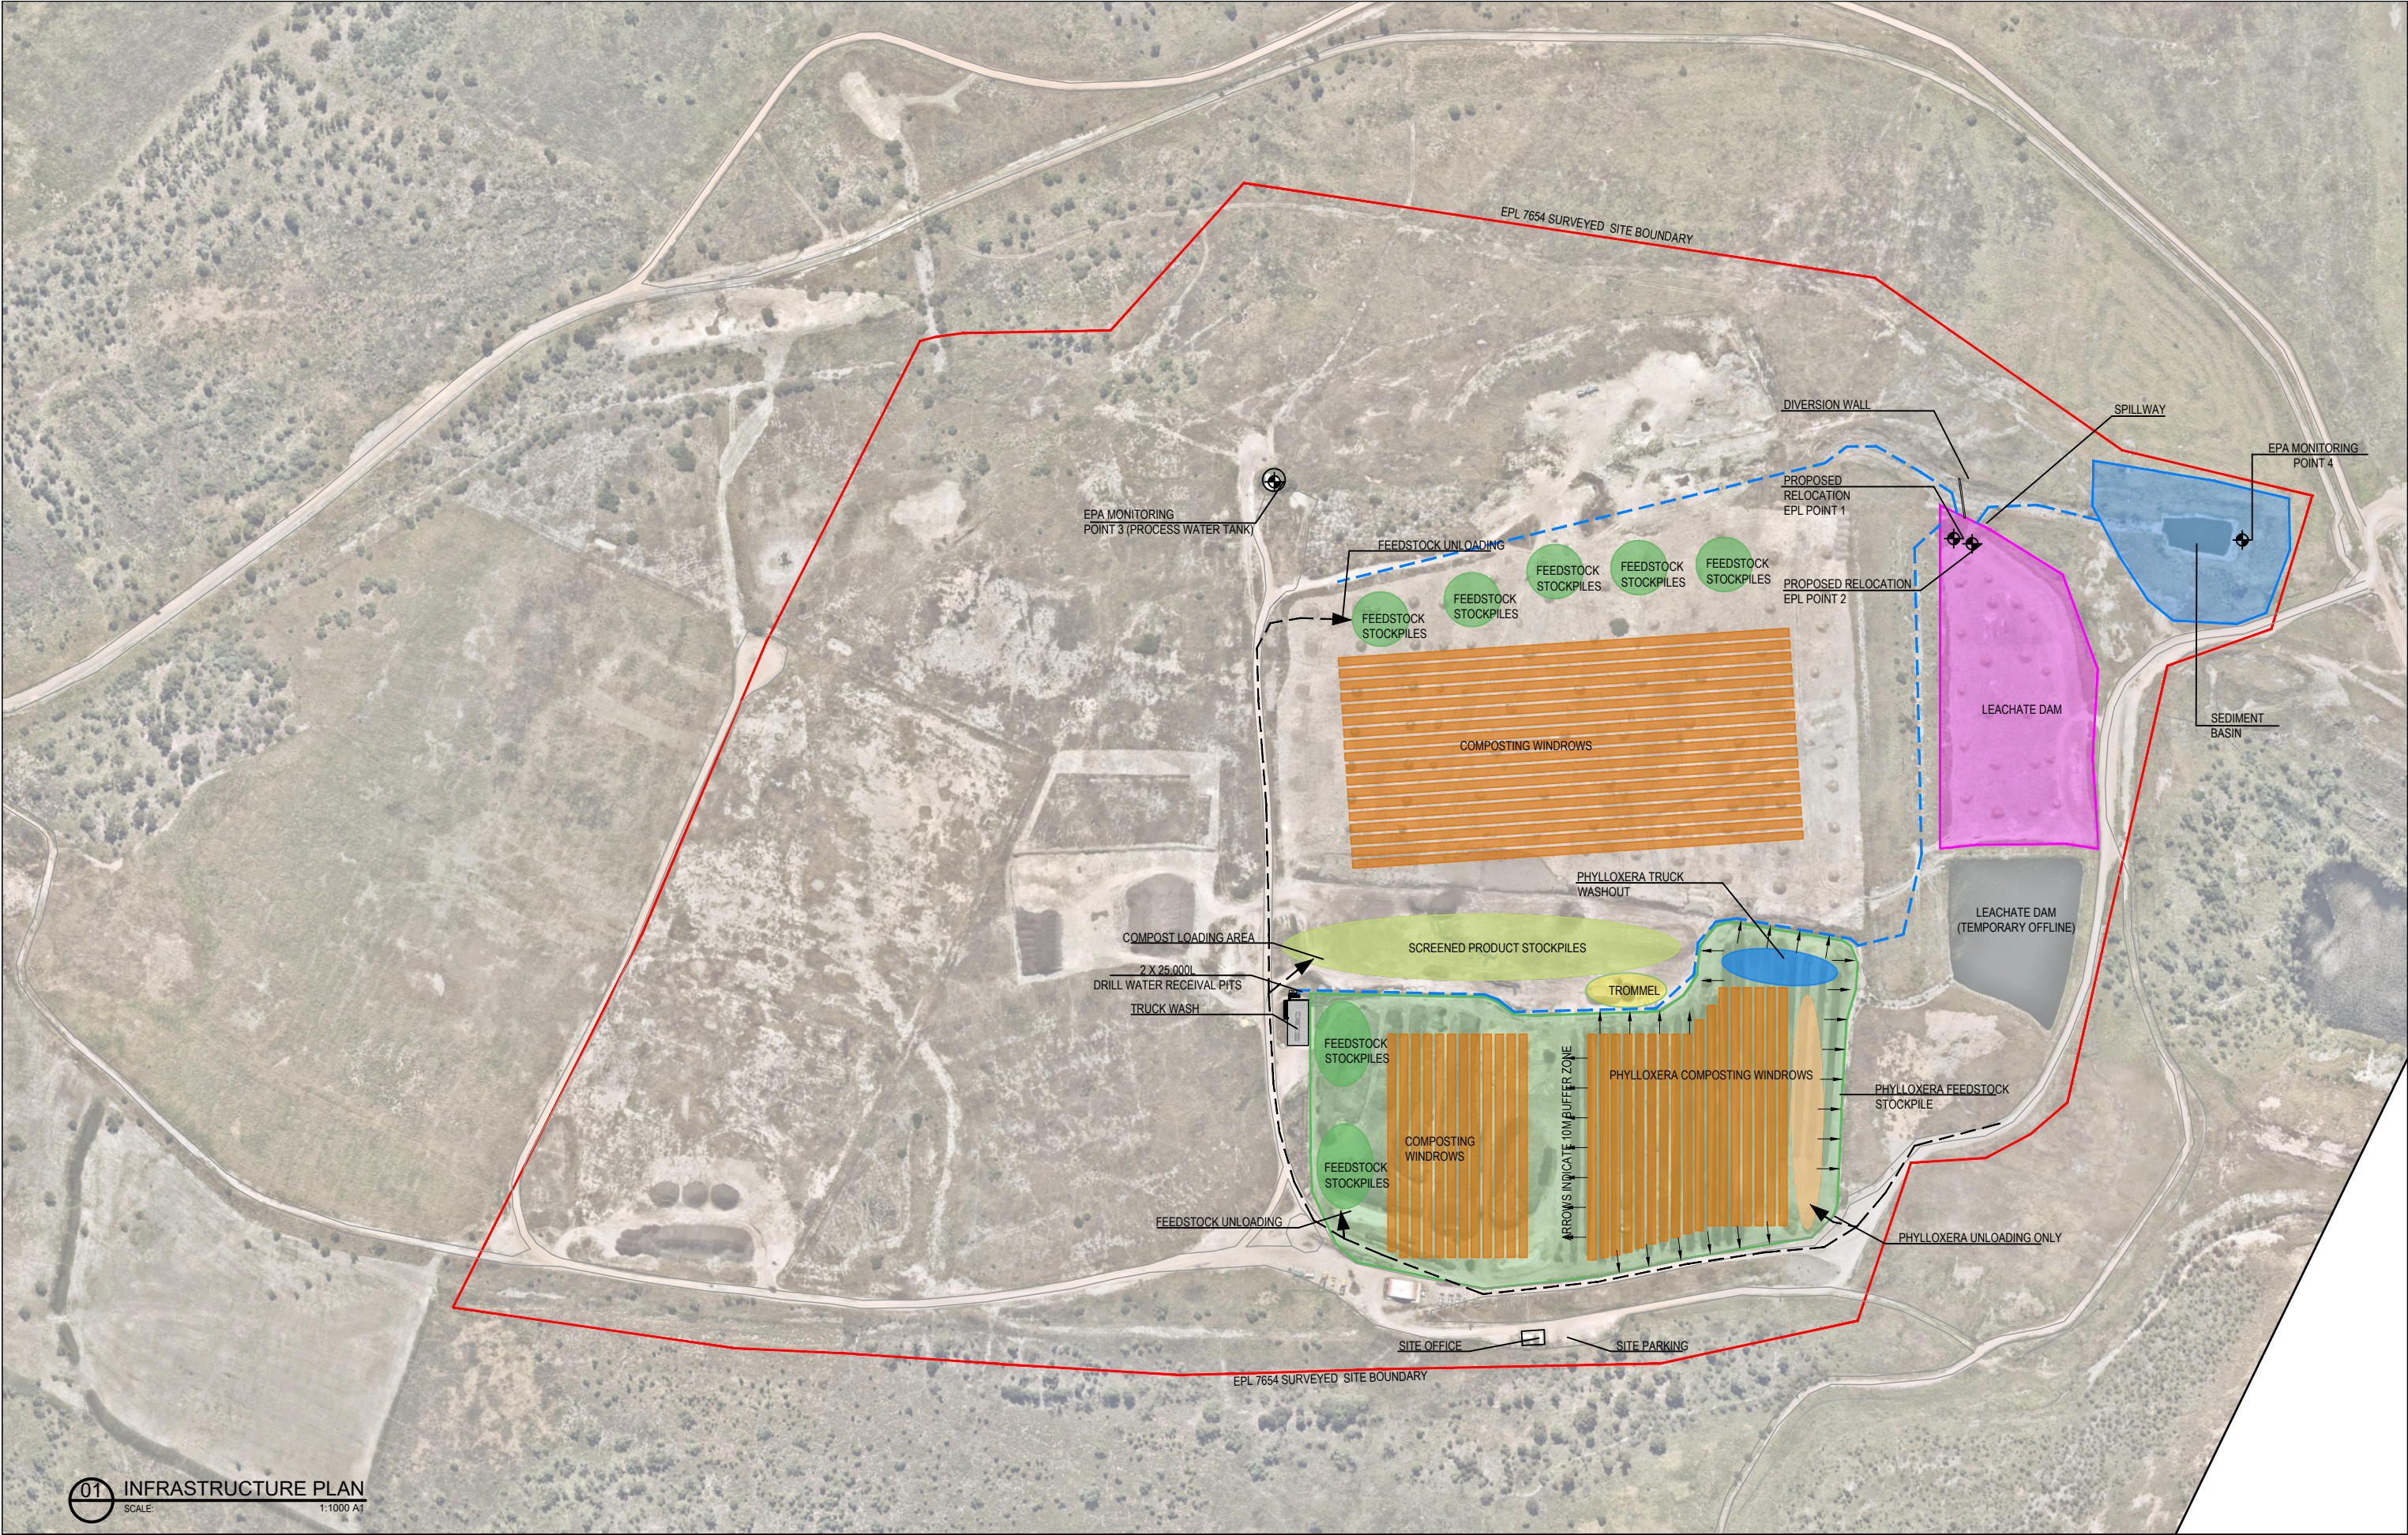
PROJECT SITE AND SURROUNDING DEVELOPMENT
